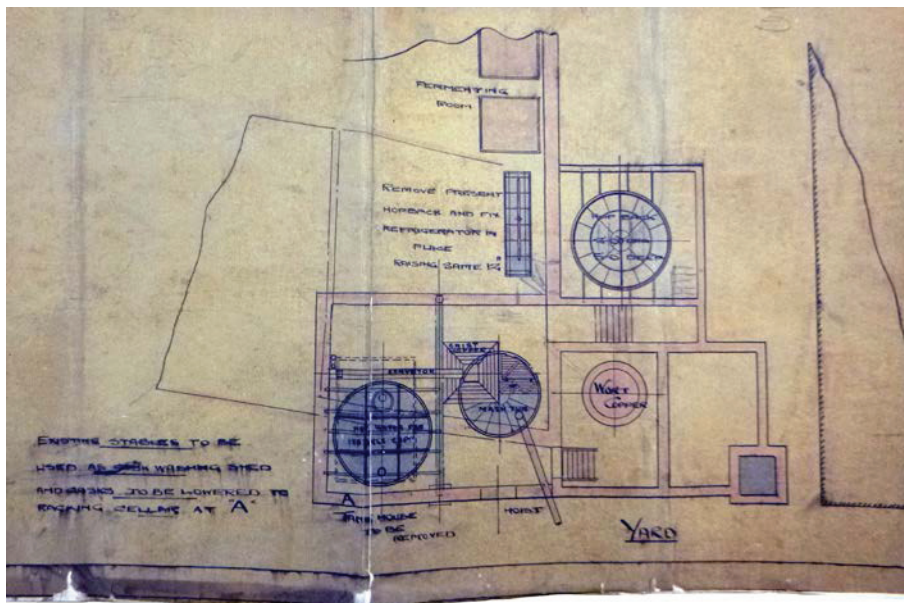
Plan of proposed re-arrangement of brewing plant, 1919
